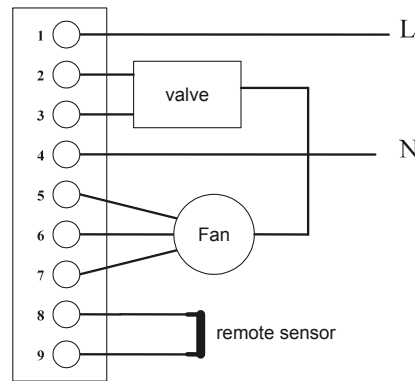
Typical wiring for 3-wire control in 2 pipes 1H1C
